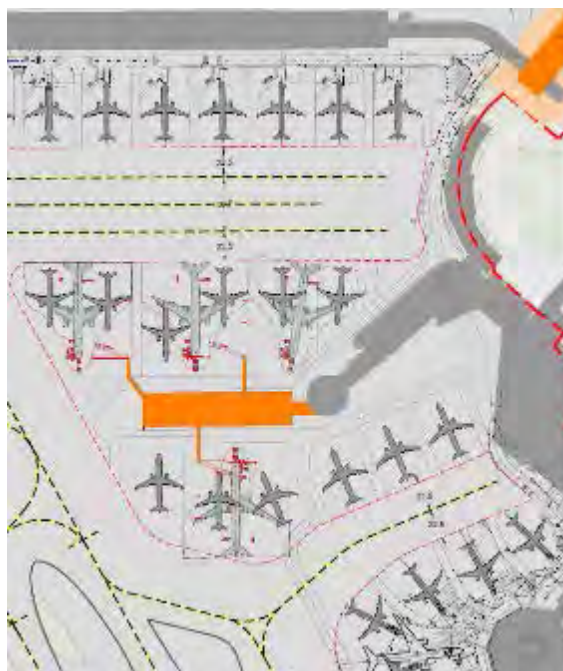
Proposed extension of Pier 2 (First floor level)
